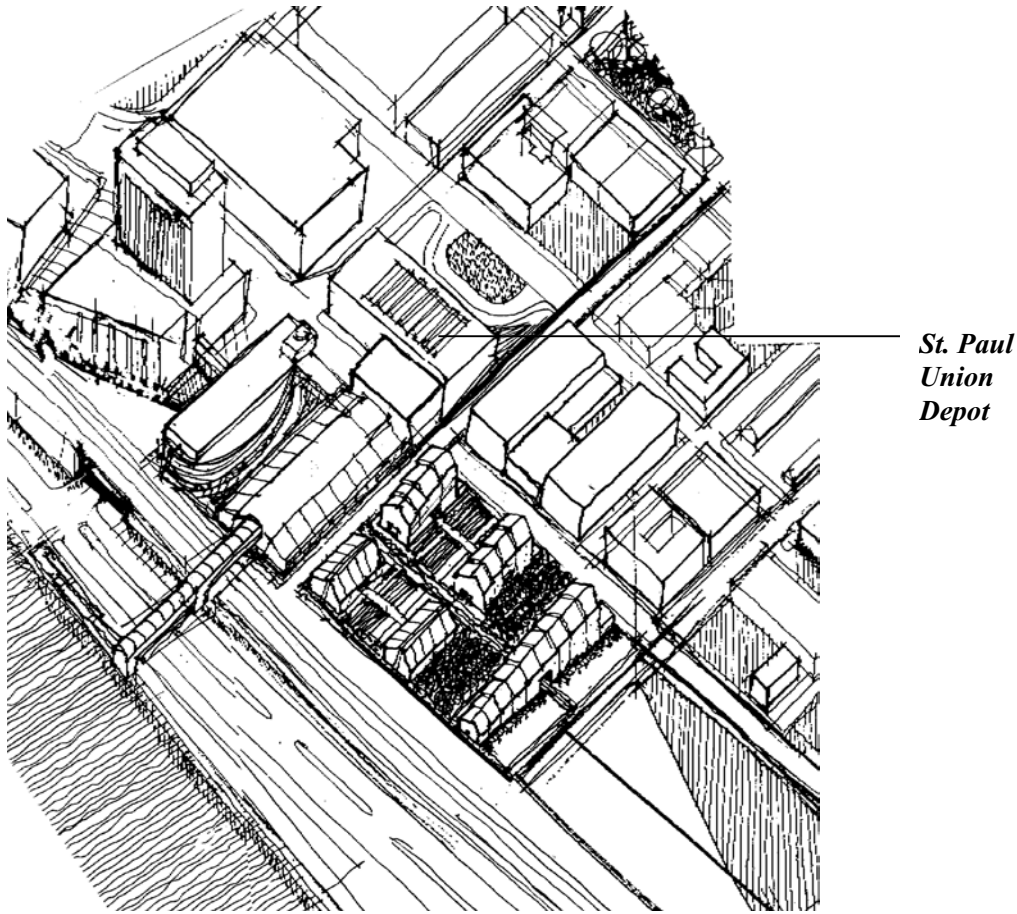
St. Paul Union Depot and Parking Deck Scheme D: Transit Use of Existing Concourse—Maximum Redevelopment, Post Office Acquisition and Relocation
